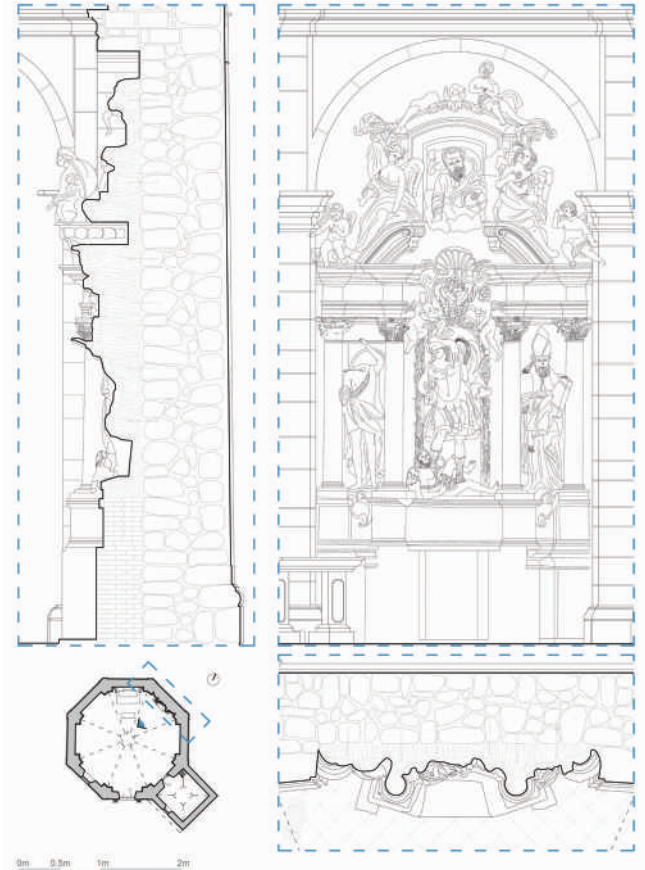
Detail in elevation, horizontal and vertical sections of the altar of St. Michel. Drawing by Luca Cetra.
